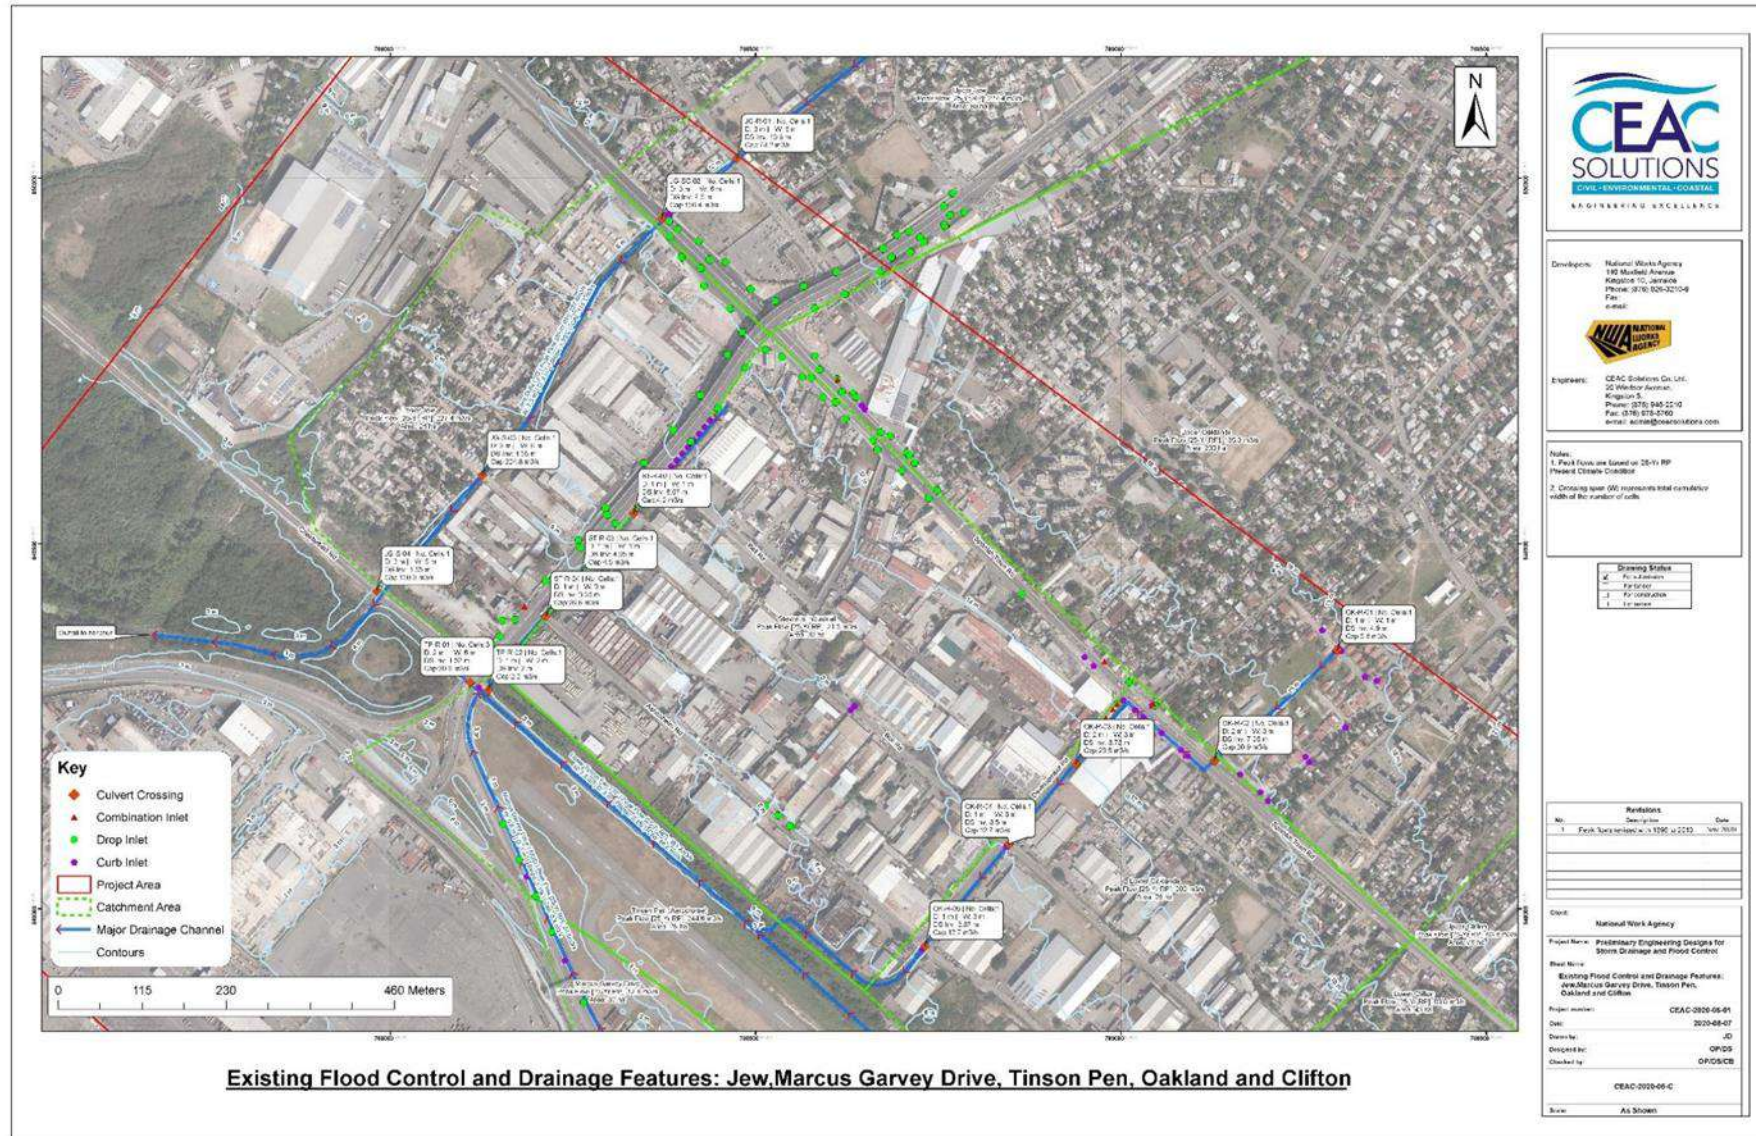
Existing Flood Control and Drainage Plan for the MGD, Tinson Pen and Clifton areas
